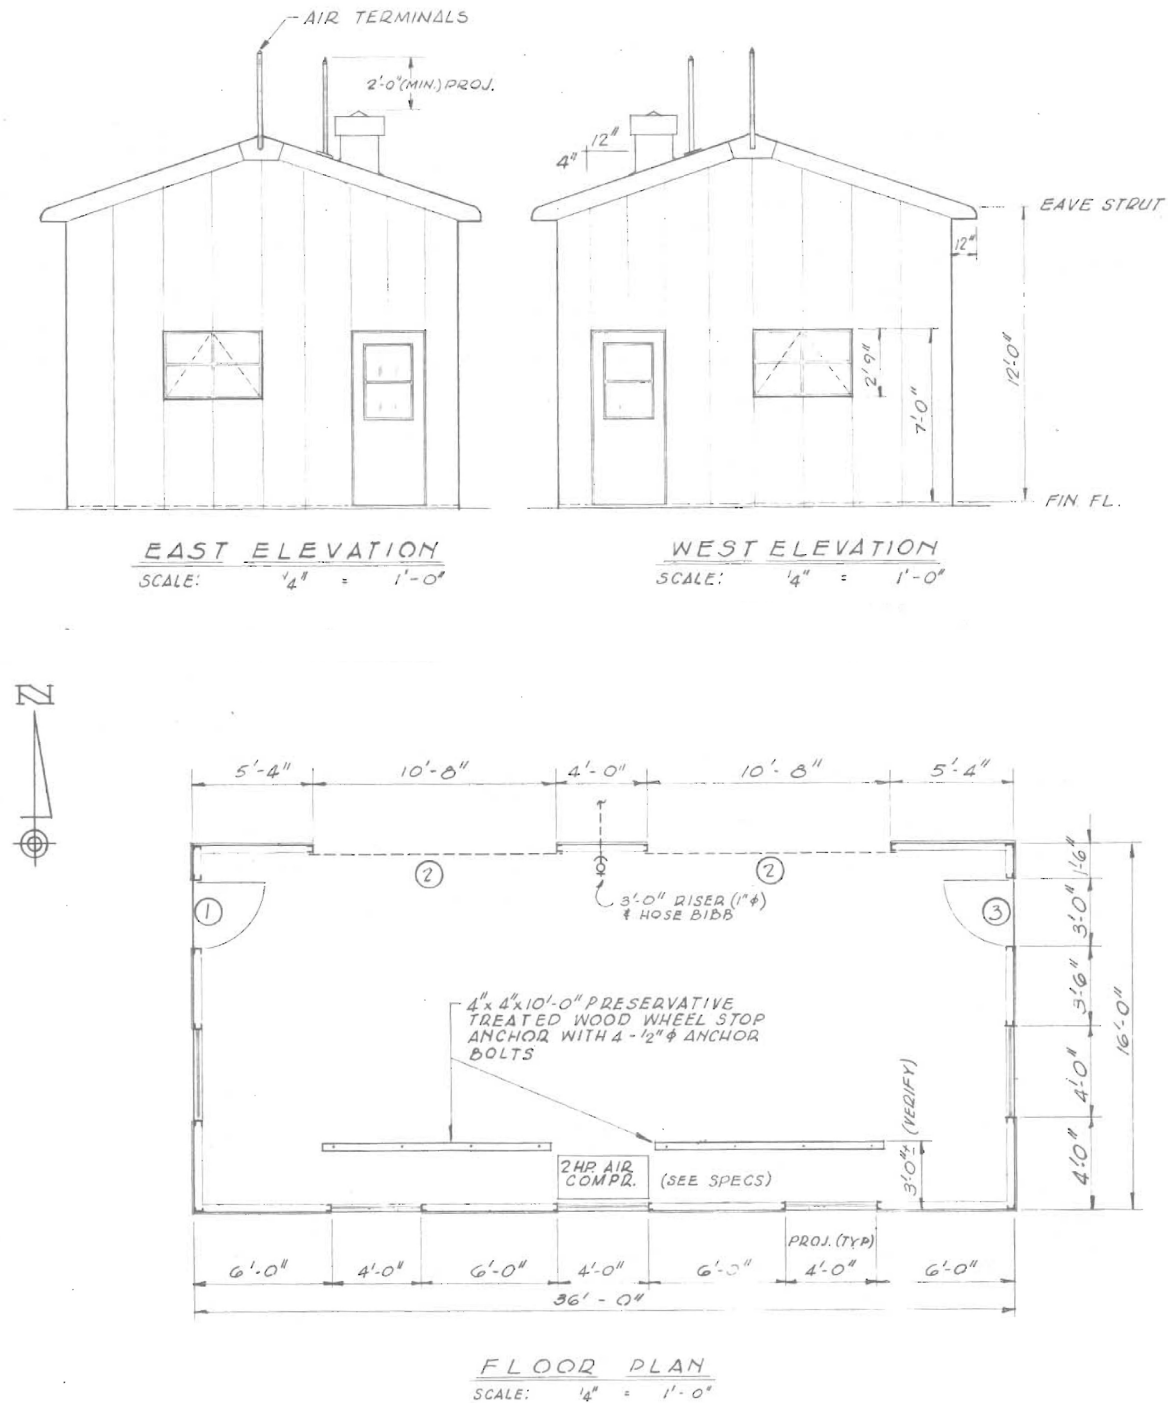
Balloon Support Building, floor plan, east and west elevations from 1963 WS-KR plans.
